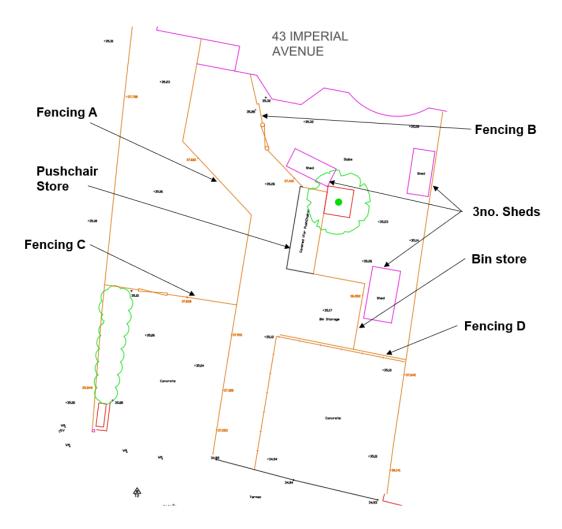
Drawing no. CLA-23260/LP003 (Existing Site Plan) from refused planning application ref. 23/00946/FUL annotated by LPA officers.
